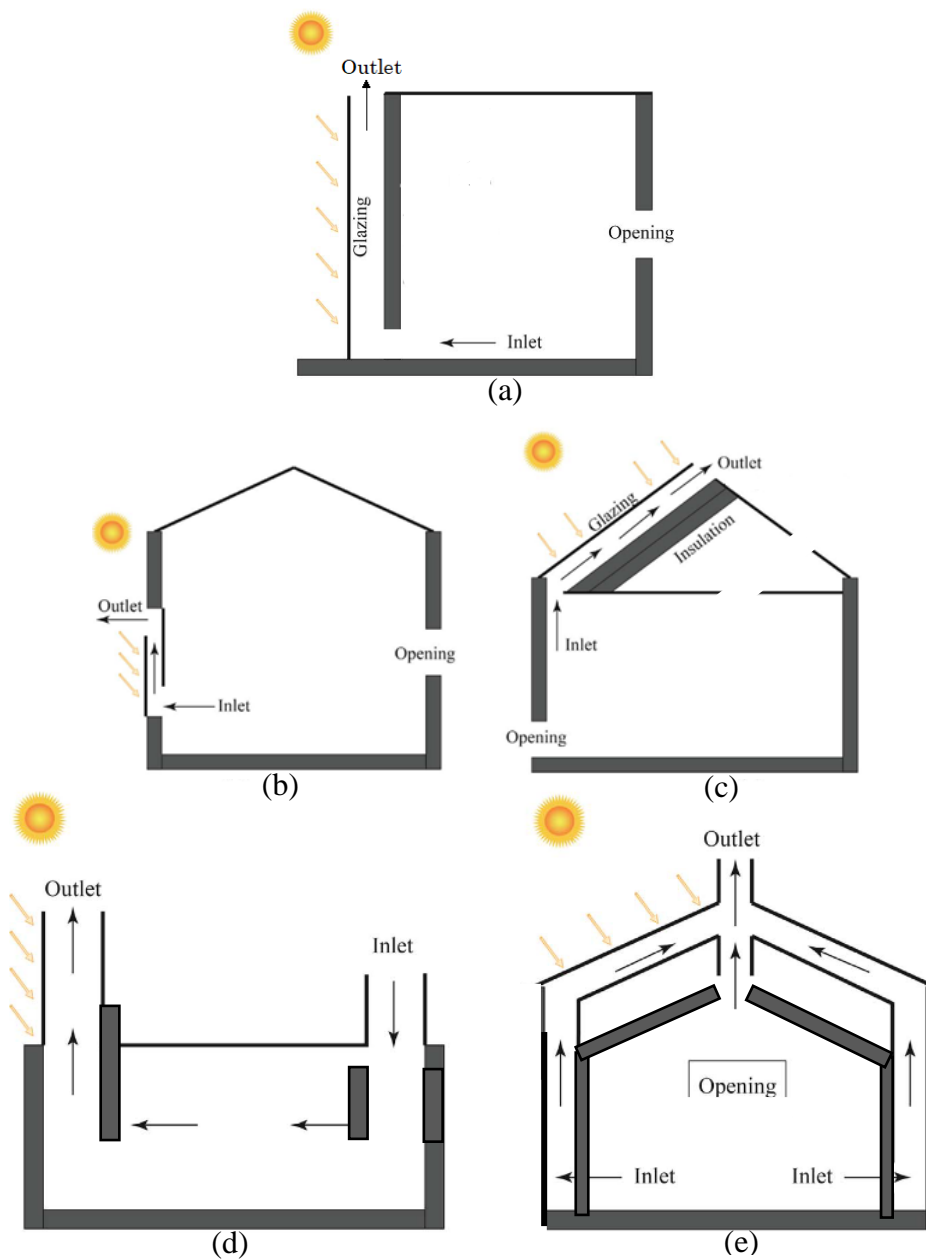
Single-story solar chimney configurations: wall-mounted solar chimney comprising (a) and (b); roof solar chimney comprising (c) and (d); combined wall and roof solar chimney (e) [34]
